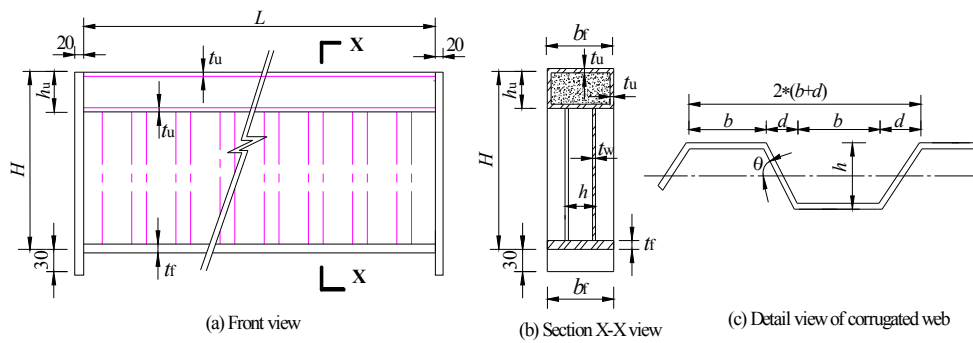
A new I-girder with corrugated web and a concrete-filled tubular flange
